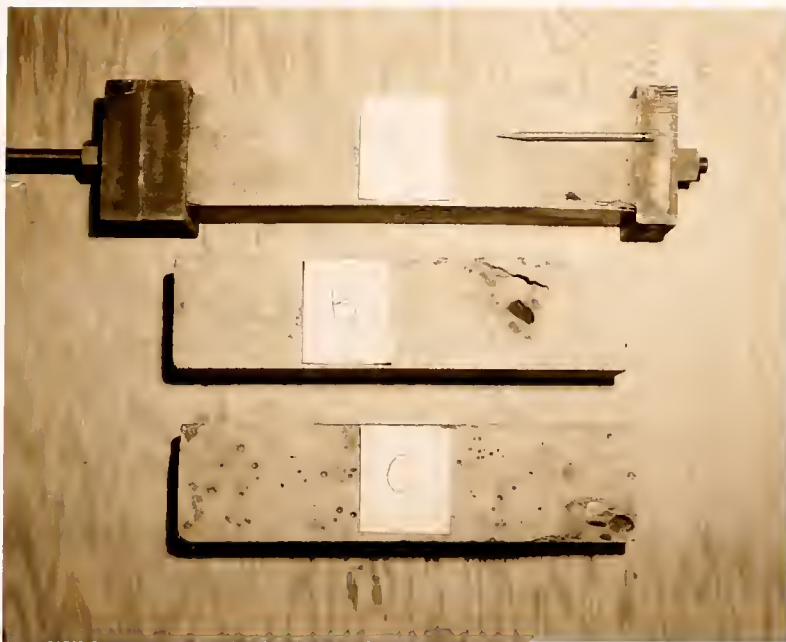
THREE TYPES OF FAILURE OF CONCRETE
